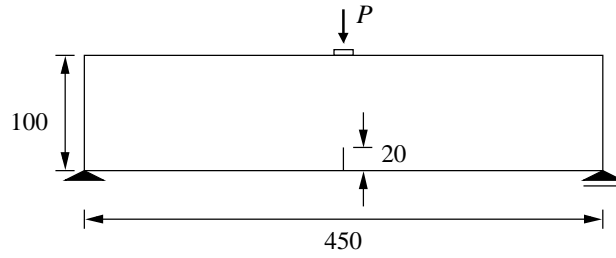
Notched beam. All dimensions in millimetres (depth=100 mm).
